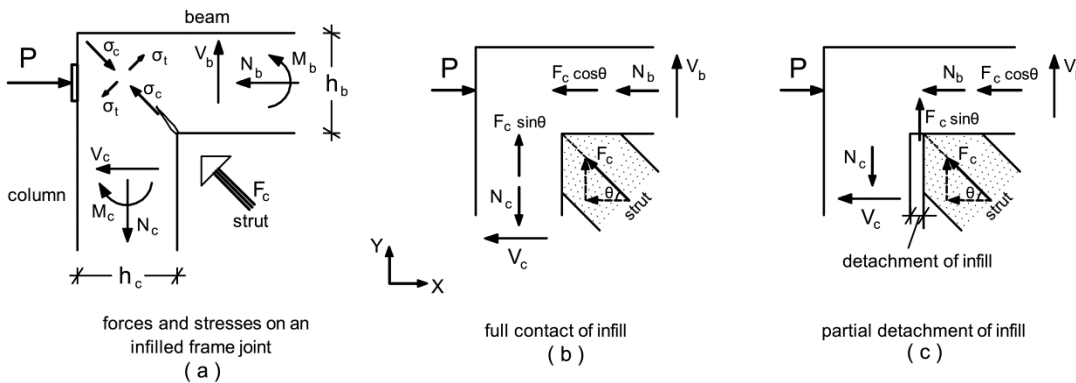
Forces and stresses acting on a joint of a frame strengthened with an infill.
